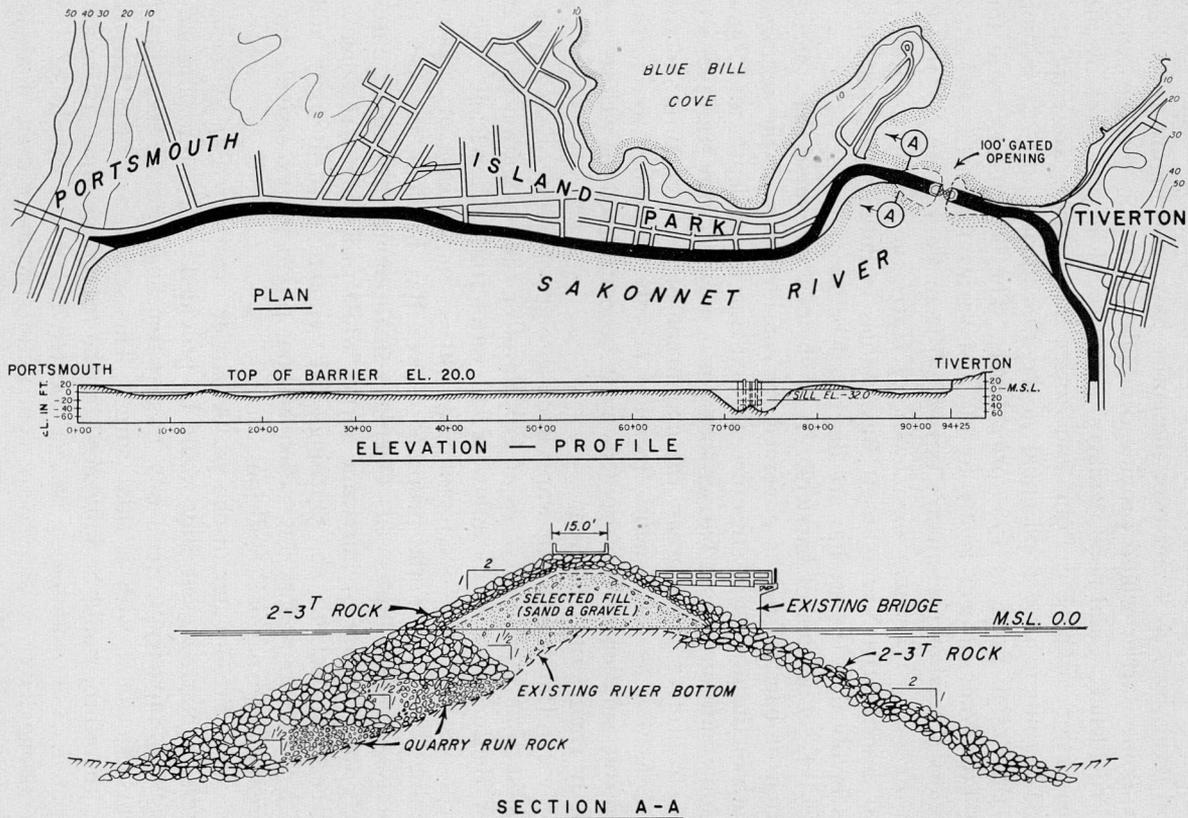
LOWER BAY BARRIER PLAN, TIVERTON BARRIER.
